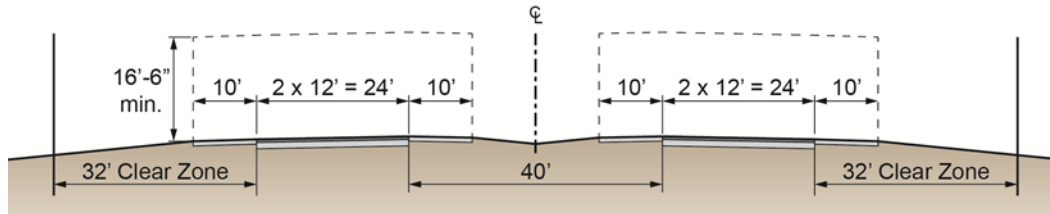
Existing, At-Grade Highway Cross Section to Be Spanned by Proposed Bridge
